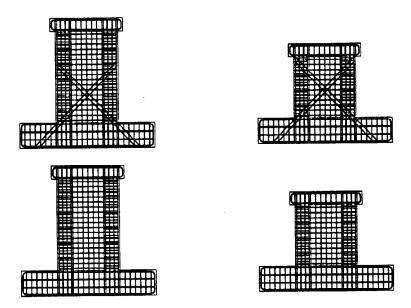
Reinforcement layout in wall specimens with aspect ratios of 1.0 and 1.5
